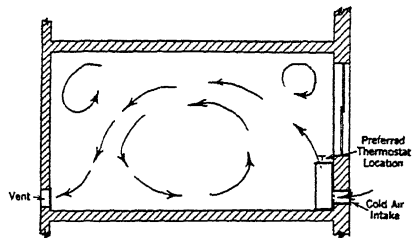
SECTION THROUGH A UNIT VENTILATOR-EQUIPPED ROOM WHEN HEATING
